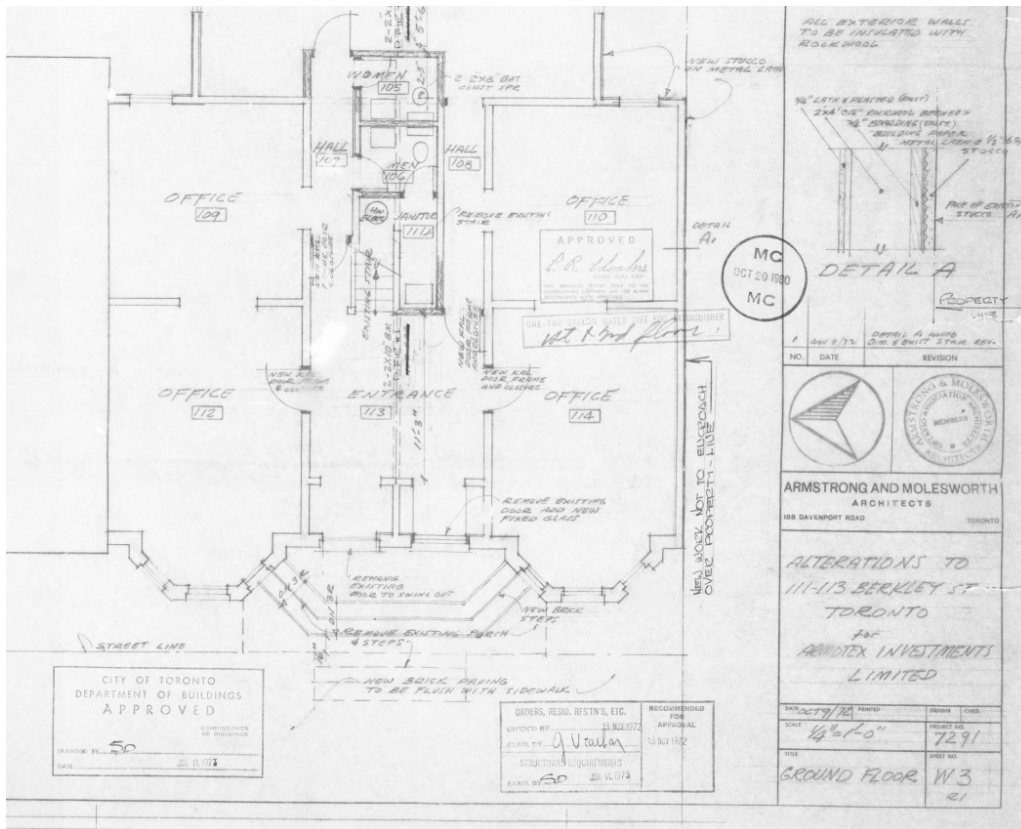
1972 ground floor plan drawing by Armstrong & Molesworth showing alterations and addition of front stair at 111 Berkeley Street (Building Records)
